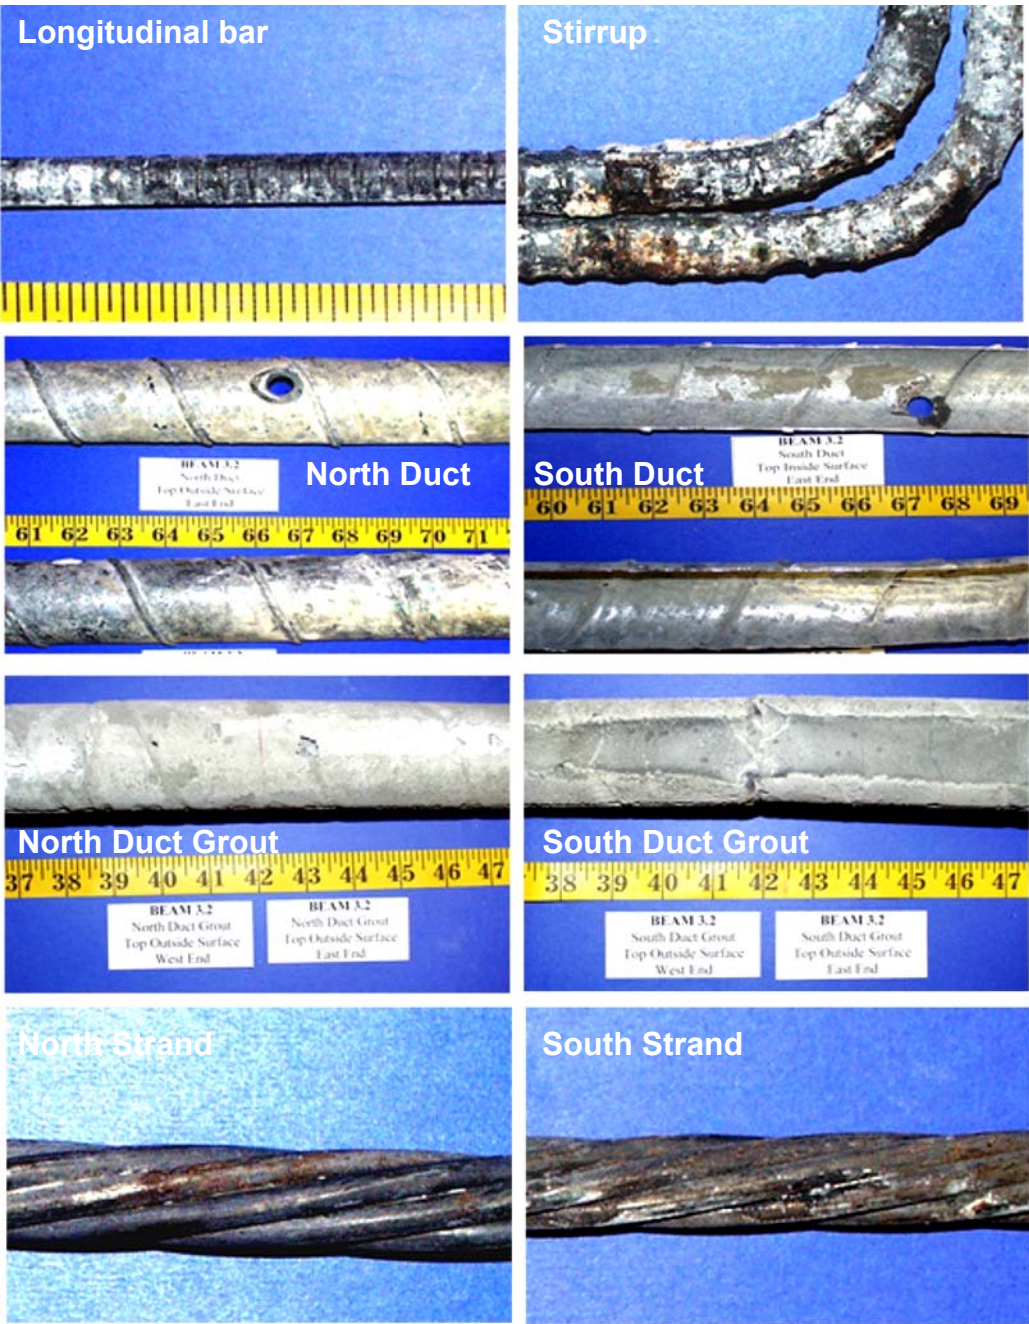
Specimen 3.2 – Grouted Duct
